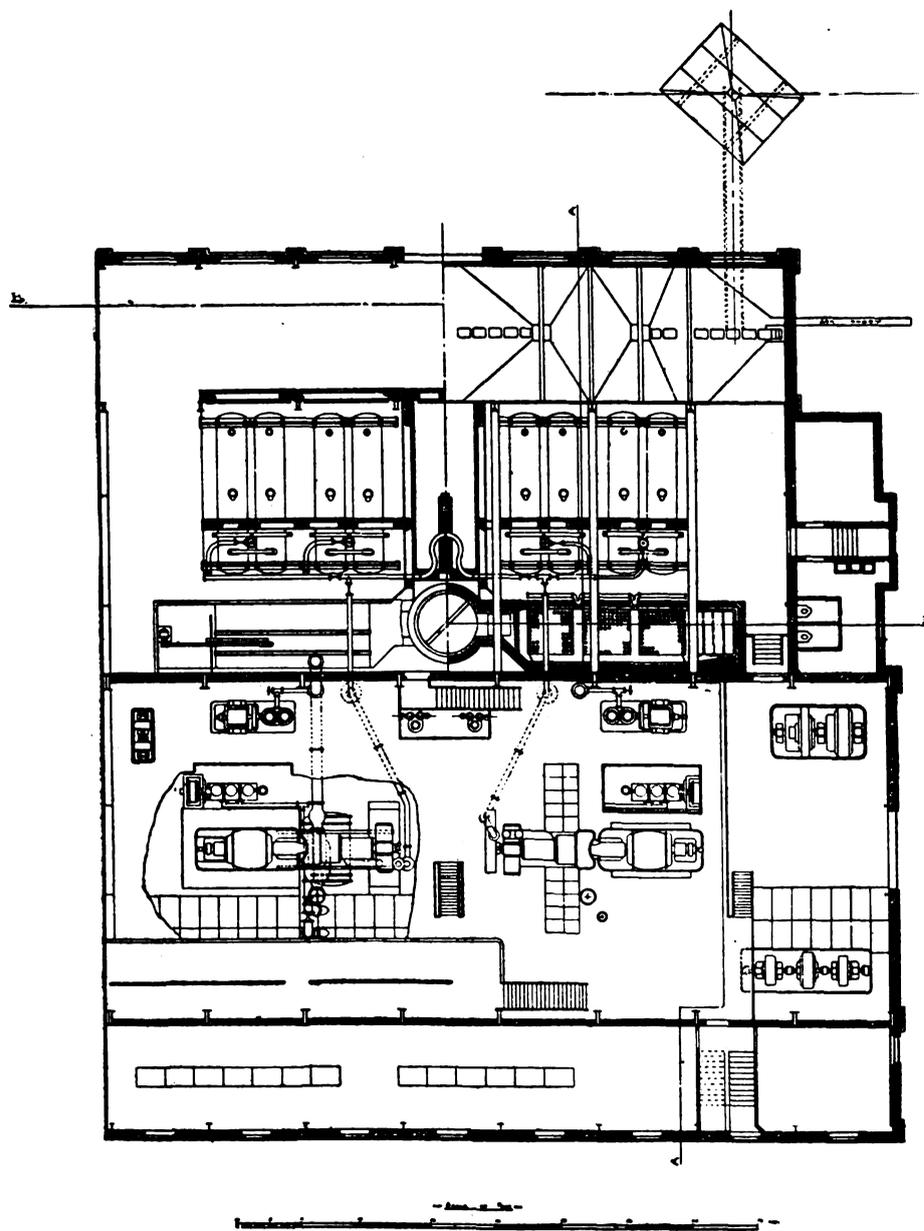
LAYOUT OF STATION EQUIPMENT.
